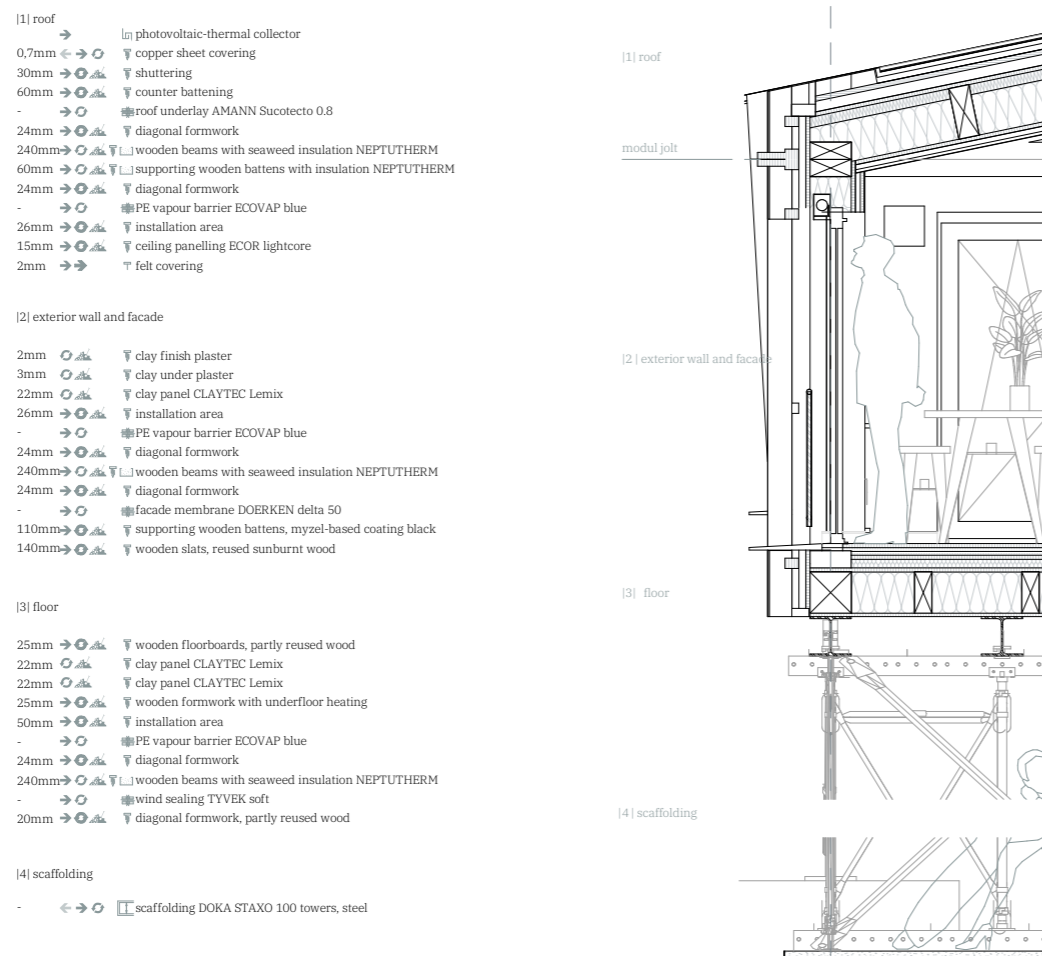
33. The façade section showing the circular material layering and circular connection details
